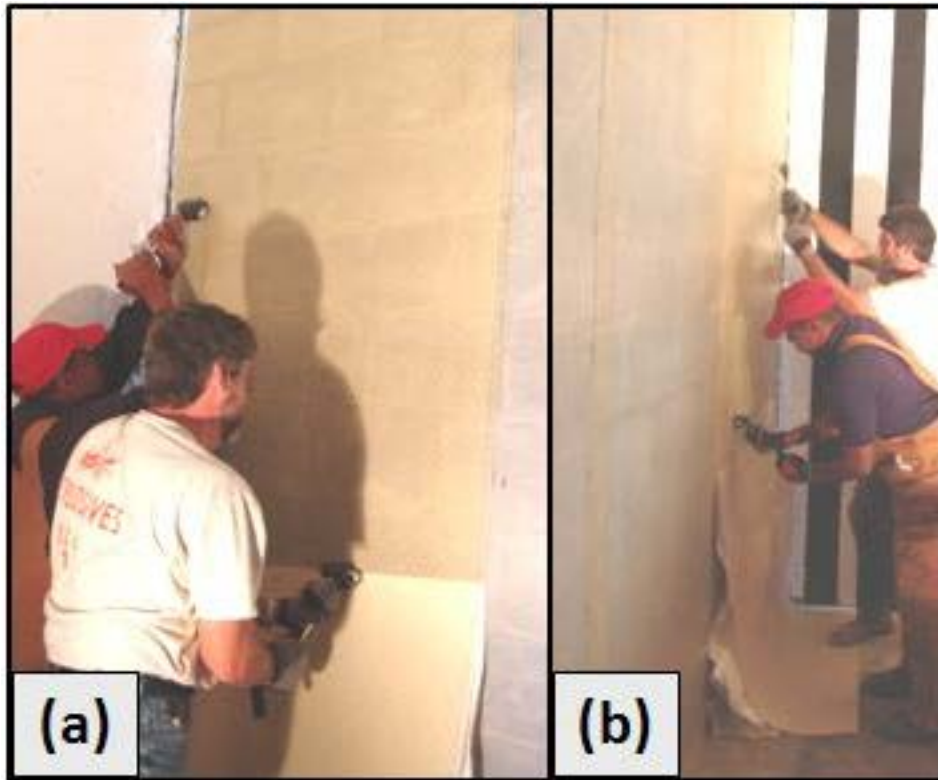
Film application. (a) Pressure applied to first sheet of film. (b) Each additional sheet overlaps the previous until the CMU wall surface is covered.
